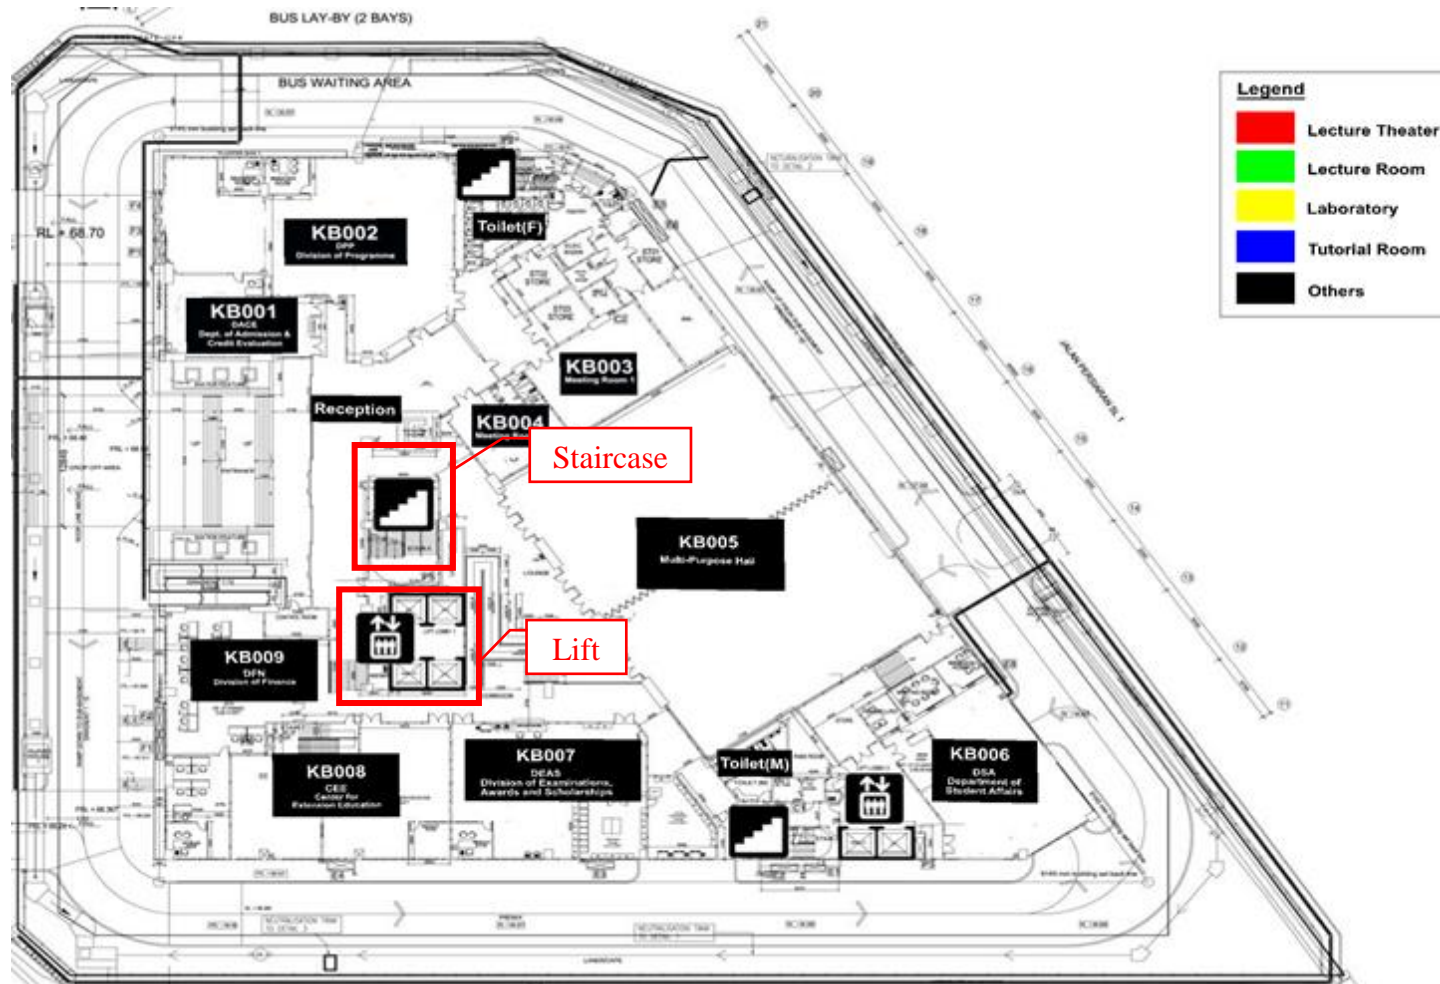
Sungai Long KB building floor plan – ground floor.
